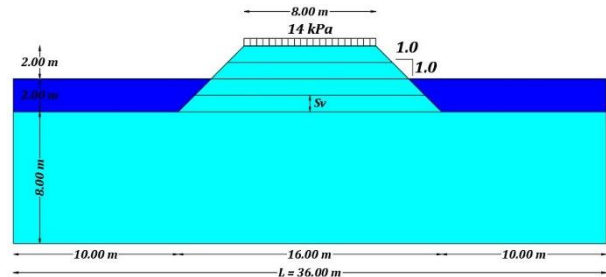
purposed Geotextile Layers Reinforcement System "GLRS" for the marine causeway
